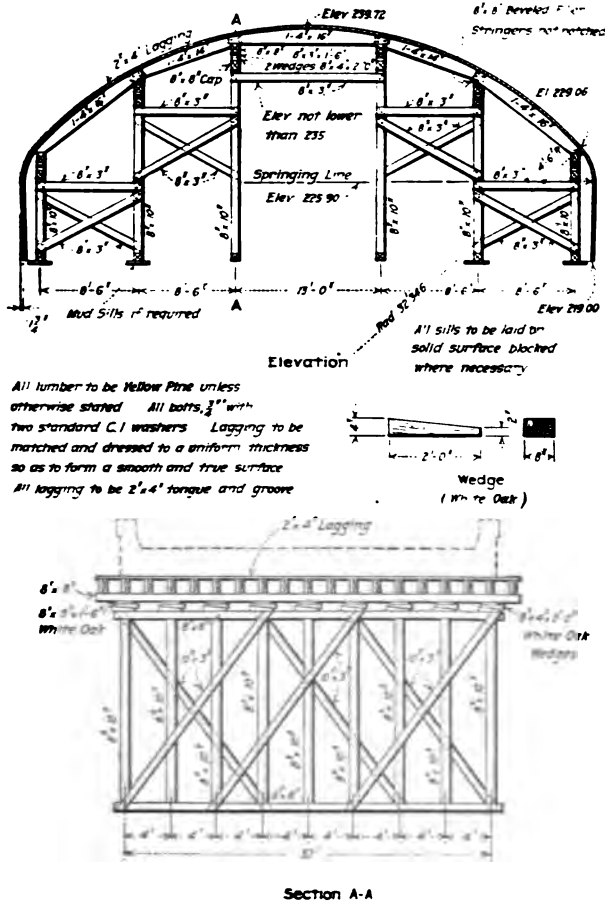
Details of arch centers for Center Street bridge, Phillipsburg, N. J.
